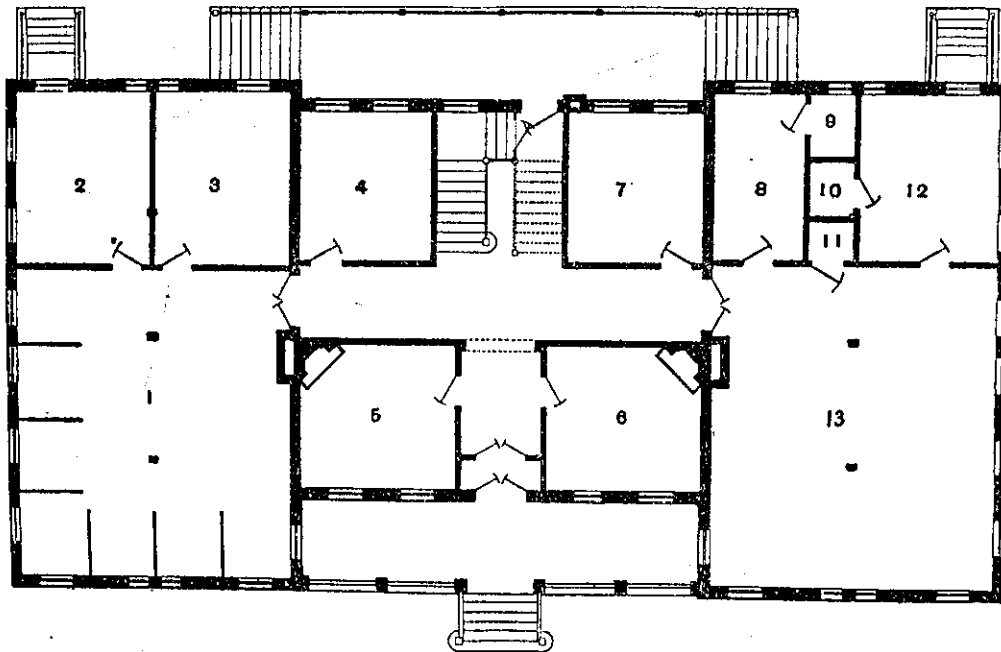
Plan of main floor of laboratory building. 1, General laboratory; 2, library; 3, chemical laboratory; 4, sterilizing and embedding room; 5, general office; 6, director's office; 7, stock room; 8, packing room; 9, closet for office storage; 10, alcohol closet; 11, janitor's closet; 12, preparation room; 13, museum.
